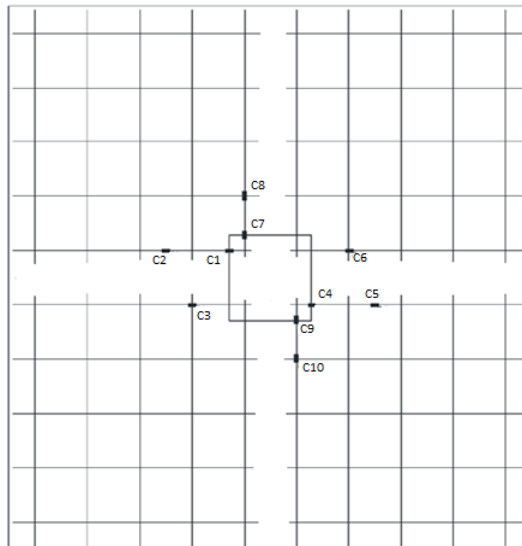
Compression reinforcement strain gage layout for 0.64% reinforcement ratio
